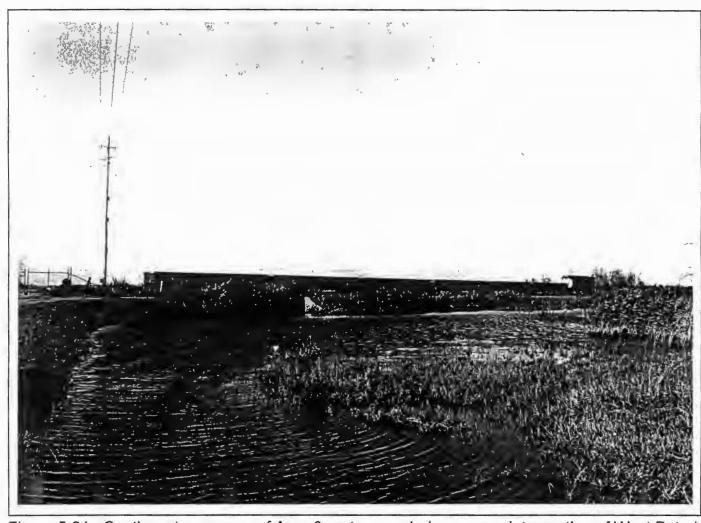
Southwestern corner of Area 3, note poor drainage near intersection of West Patrol Road and Indian Creek Road, facing west. Seneca Army Depot Activities, Seneca County, NY.
